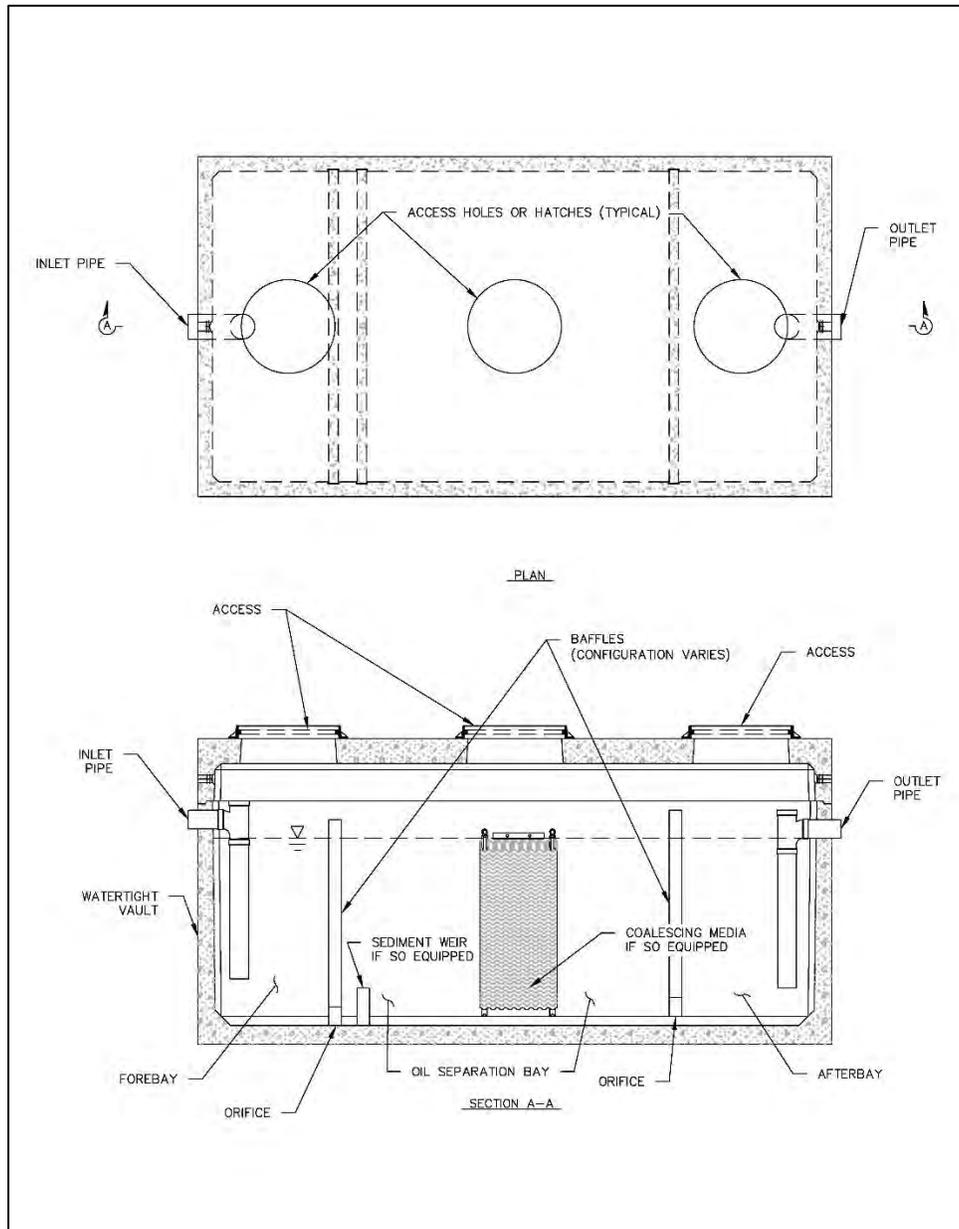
Oil/water Separator Schematic Plan and Section View (Not to Scale)²
